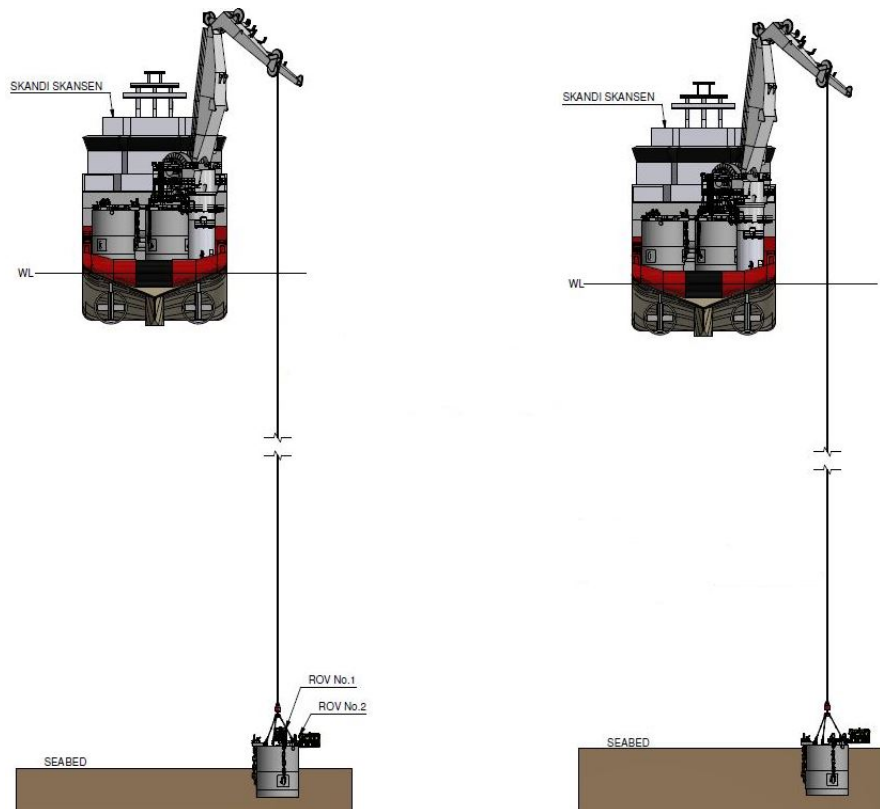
Anchor landed and fastened (DOF (2019)).
